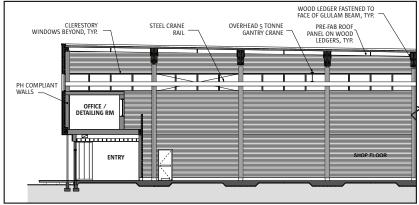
Partial building section: The CLT wall panels span two structural bays, and are staggered to improve diaphragm action
